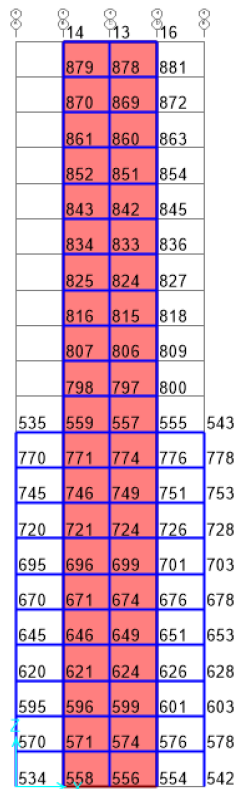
Elevation View of G+20 Core Shear Wall Model
